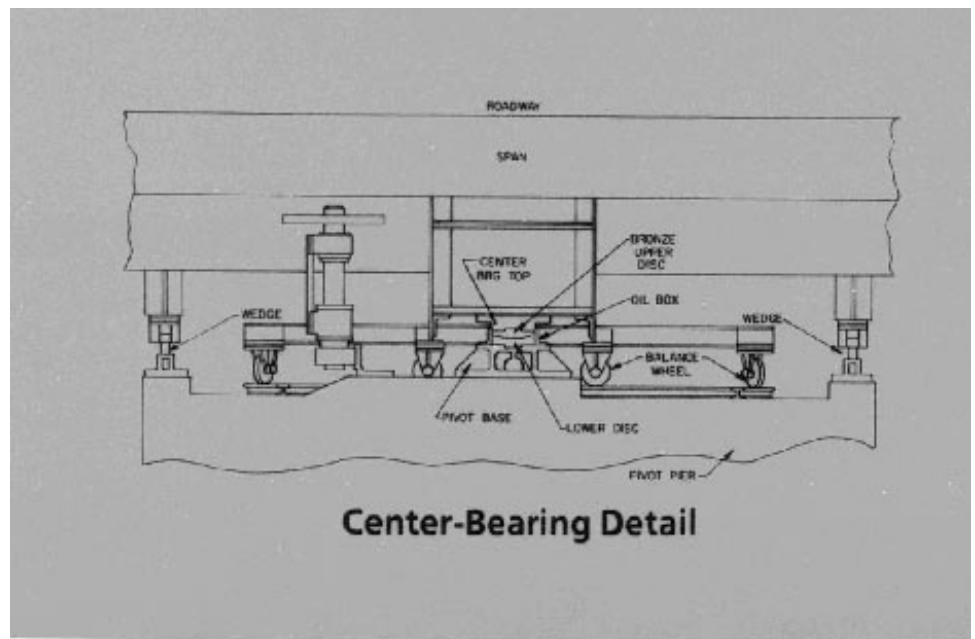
Layout of Center-Bearing Type Swing Span with Machinery on the Span
